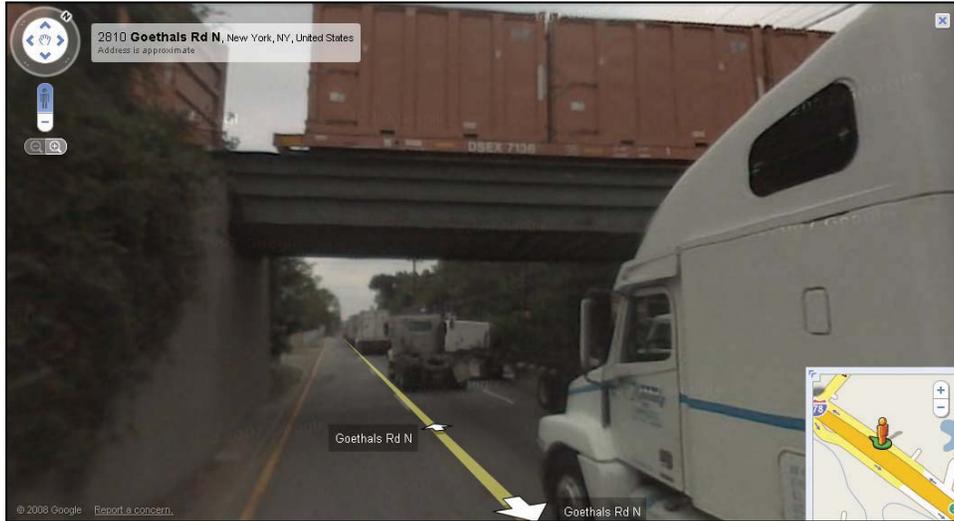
Travis Branch over Goethals Road North. Google Street View.
